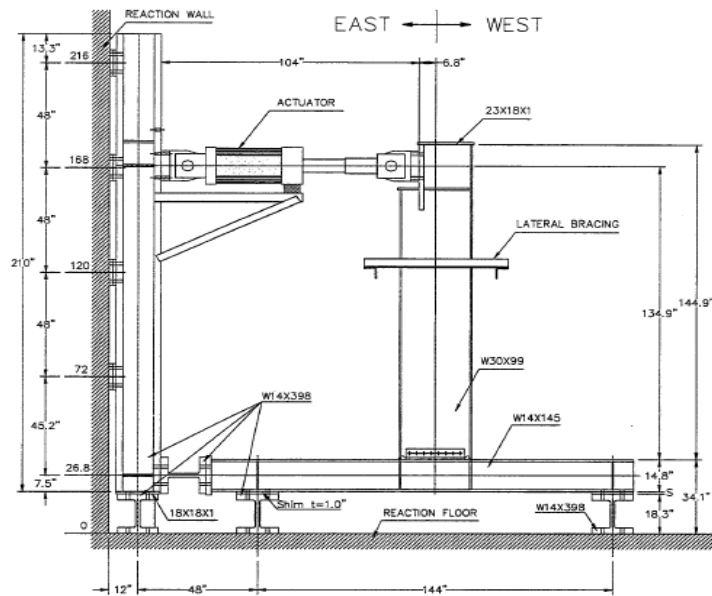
Beam-to-Column Test Configuration 1^T – Interior
